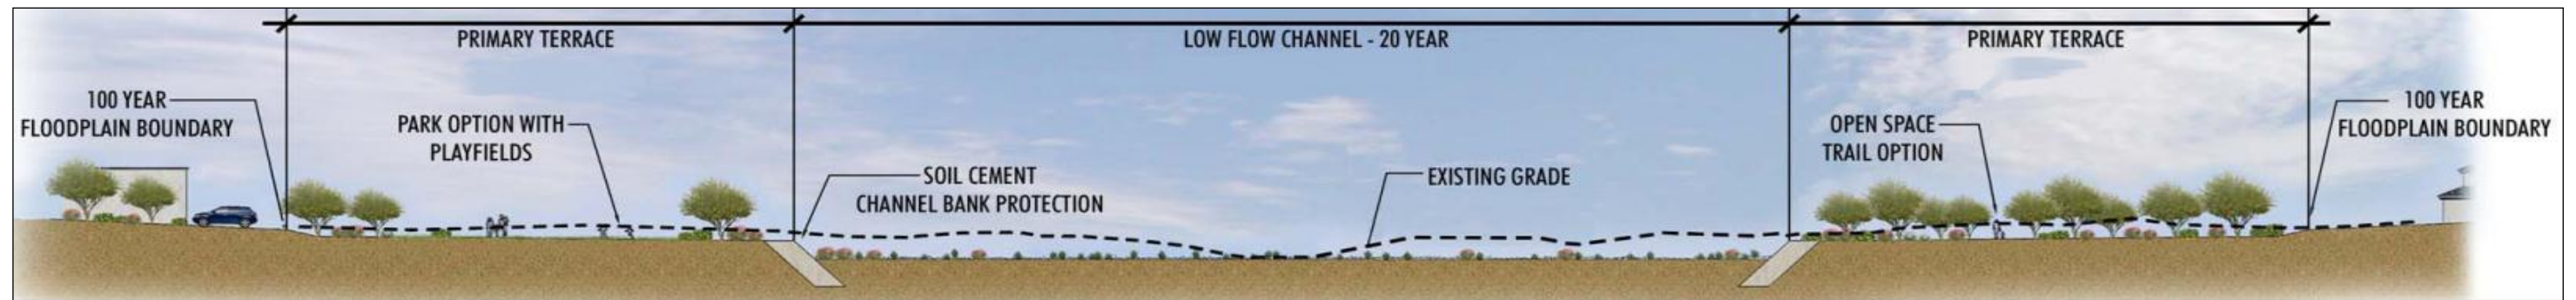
Artist’s rendering of River Master Plan concept cross section
